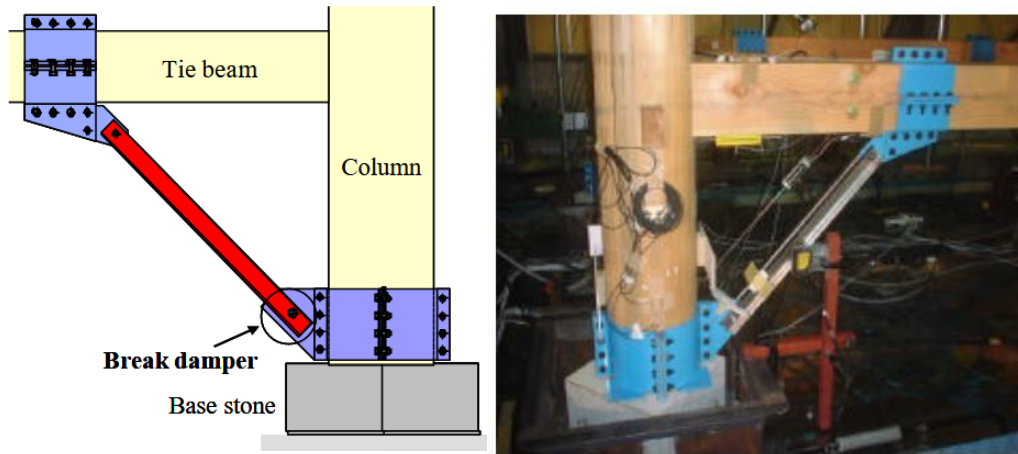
Installation of brake damper (SUZUKI et al., 2001) [29]
